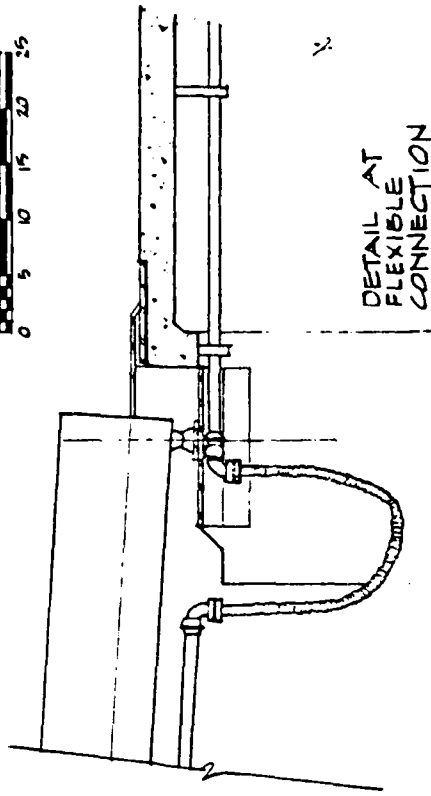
Sections, Mechanical Laterals, Utility Gallery, Typical for Pile-Supported or Floating Pier.
